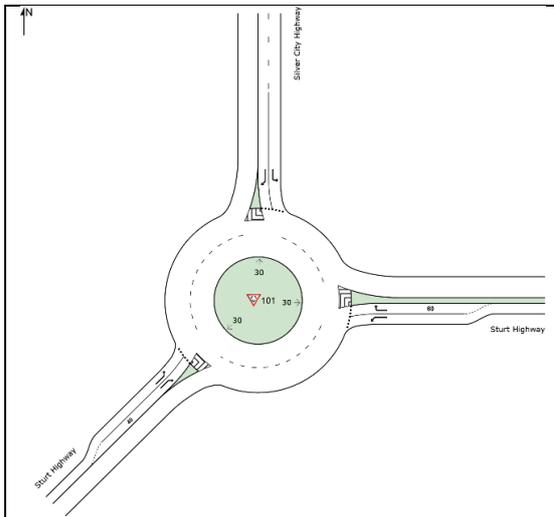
Sturt Highway / Silver City Highway – SIDRA layout
